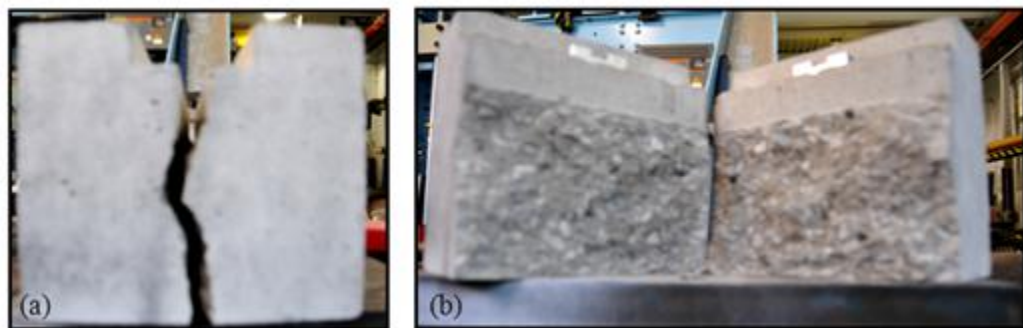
The WST-specimen (WST6) after failure (a) the cracked specimen, (b) the fracture surfaces
